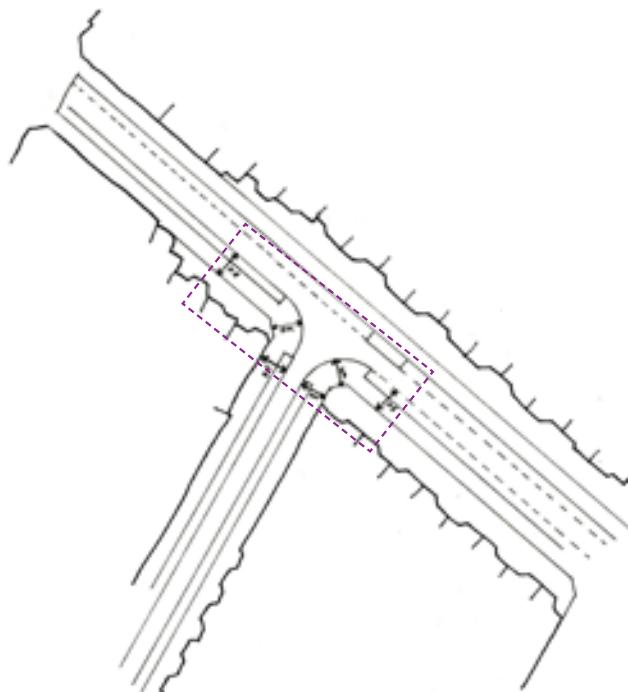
Model 2 - creating separate spaces widening the corners of the sidewalks
